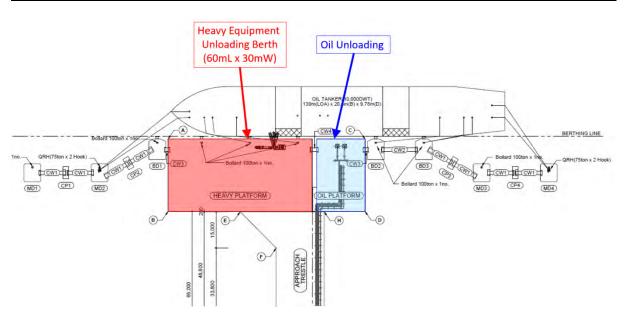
Plan view of the Heavy Equipment Unloading Berth
